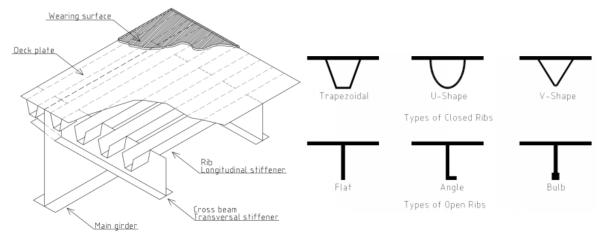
Orthotropic steel deck and types of ribs (Håkansson & Wallerman, 2015)
